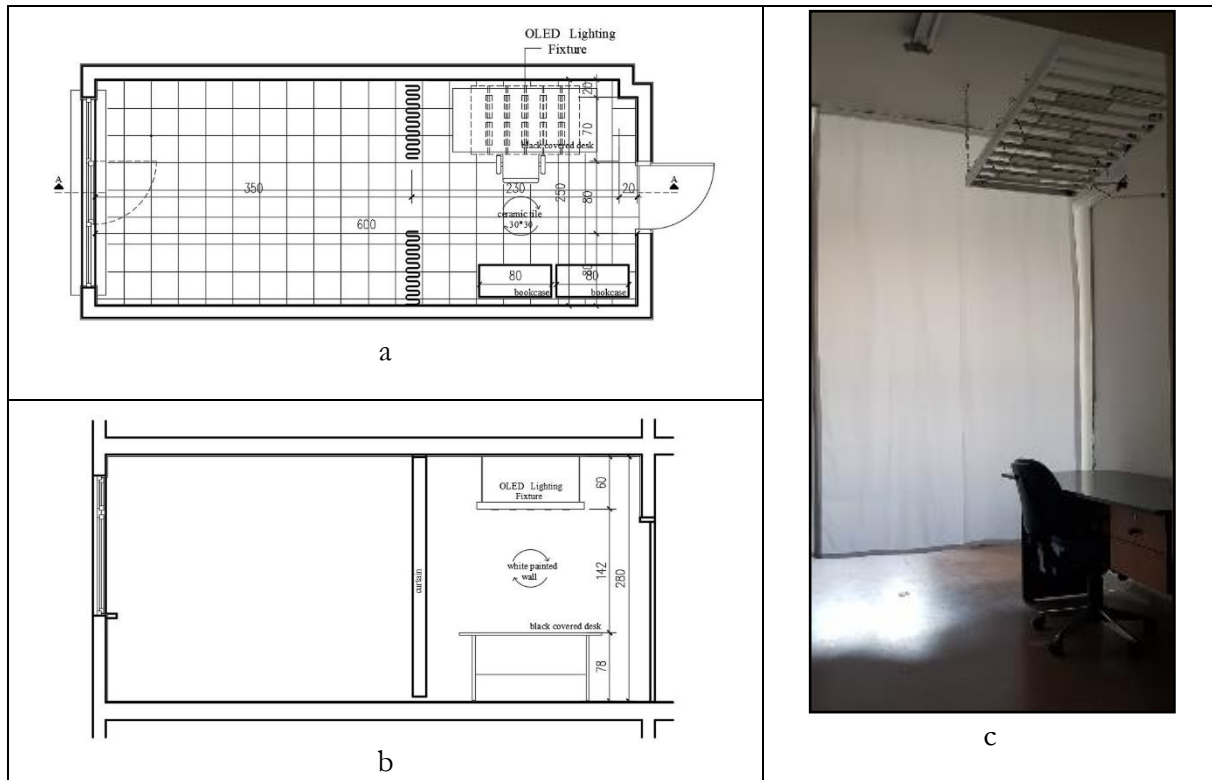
a) Schematic Plan, b) Section of the Full-Scale Indoor Office Environment (not to scale), and c) A Photograph of the Test Environment (first author's archive).
